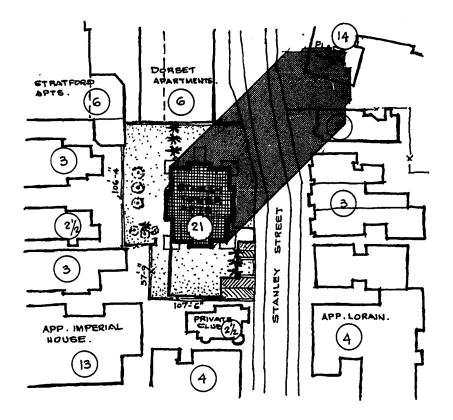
STANLEY TOWER APARTMENTS. (Bylaw No.2812) 3470 Stanley Street
